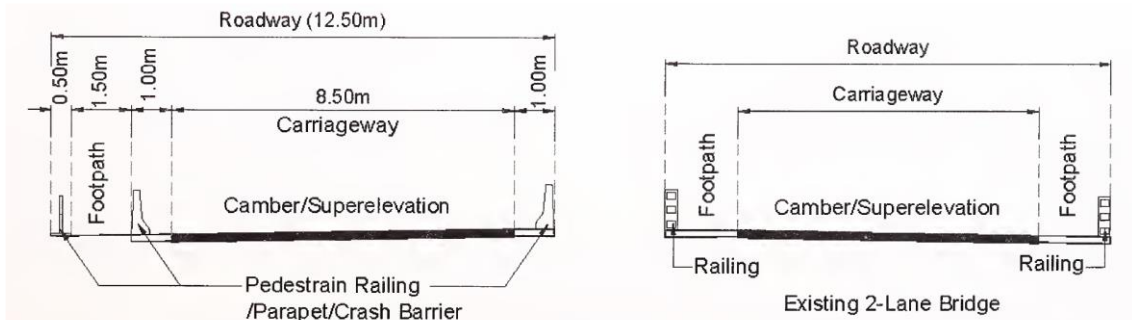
A : Cross Section of Bridge at Deck Level - with Footpath
